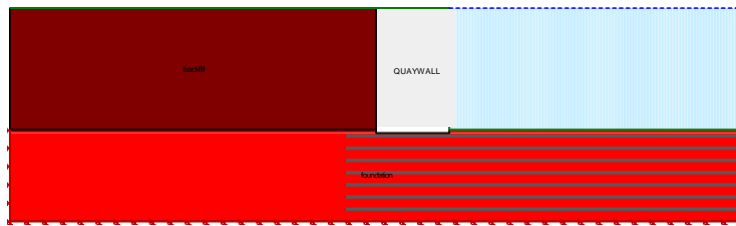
A quay wall model reinforced with foundation soil only (Case C)
